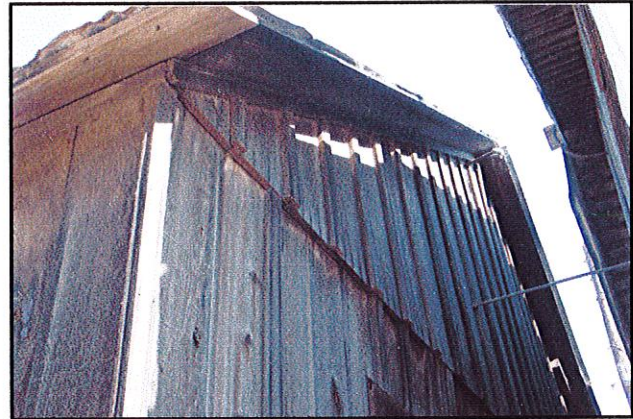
Ancillary wood barn, ca. 1915. This detail view of the eaves and board-and-batten siding is facing northeast, toward the south elevation. Photograph date, November 5, 2002.
